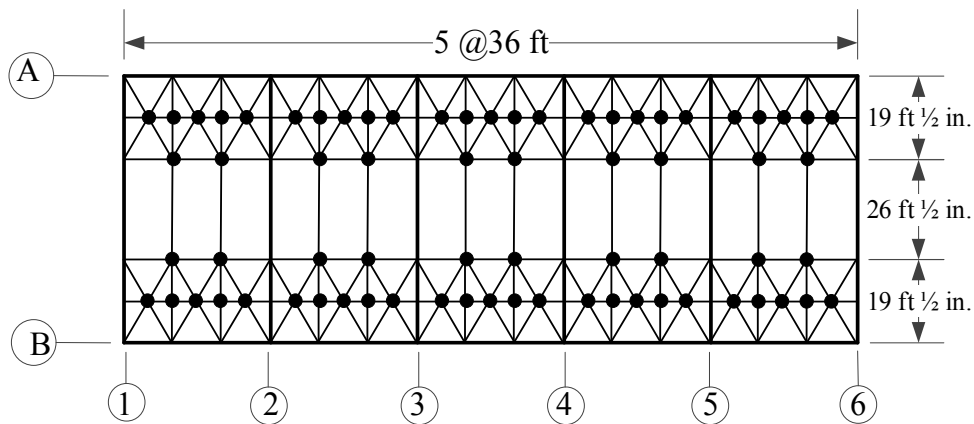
Locations of the applied lateral earthquake forces on the steel horizontal trusses.
